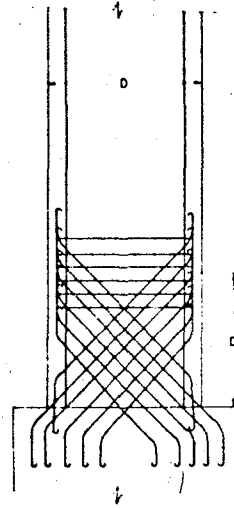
Diagonal Web Reinforcement at the Base of a Wall
